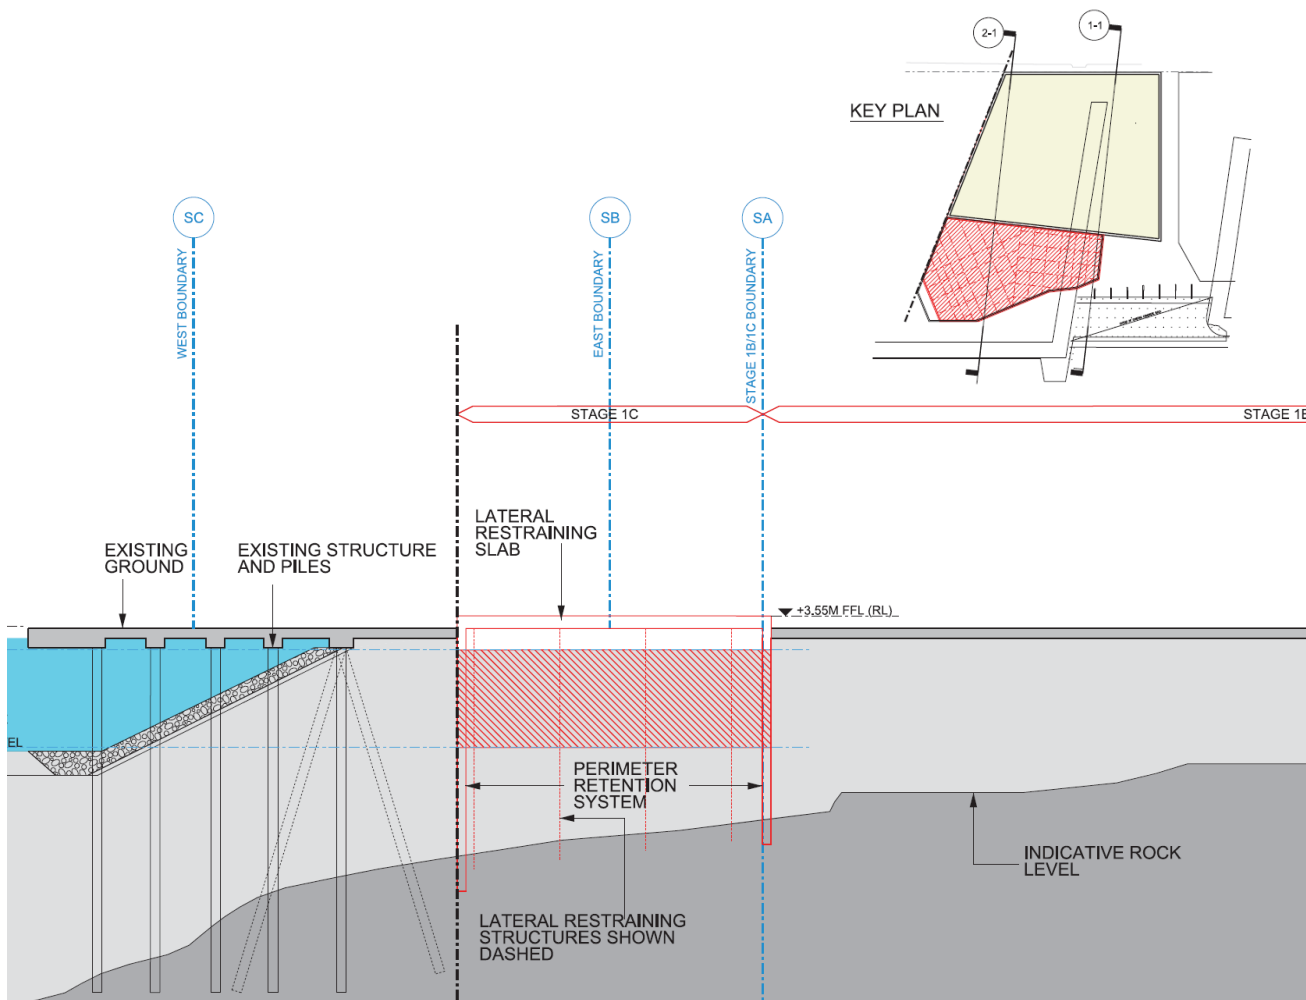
Approved extent of Stage 1C retention wall system and excavation area (Section 1 – not affected by proposed modification)
